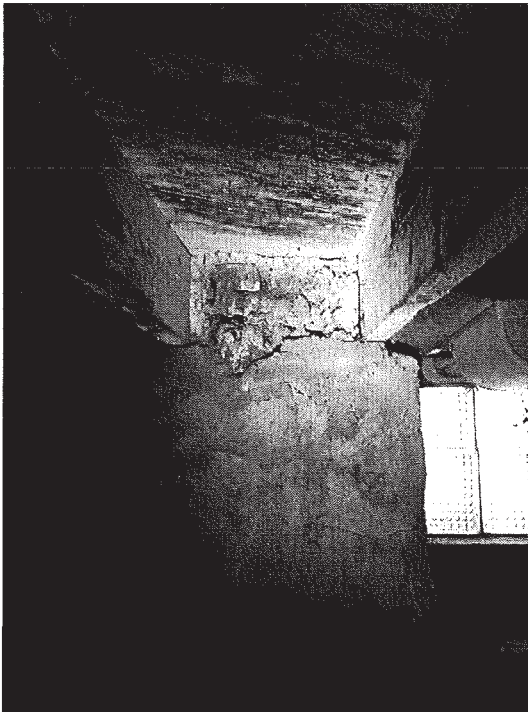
Damaged/Rotted Wood Floor Joists
